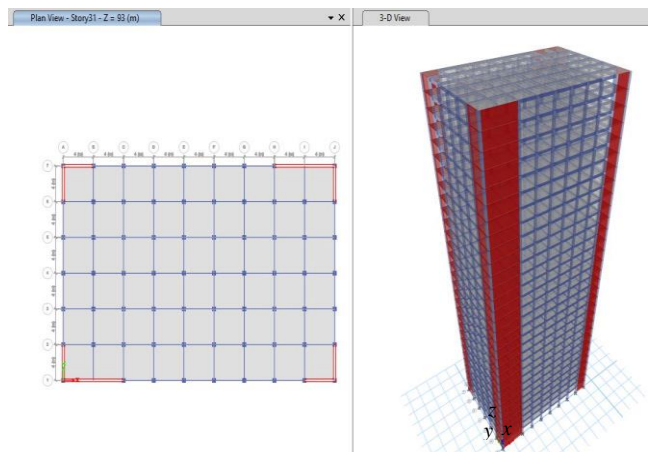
Model 2- Buildings with shear walls located at all four corners-1
